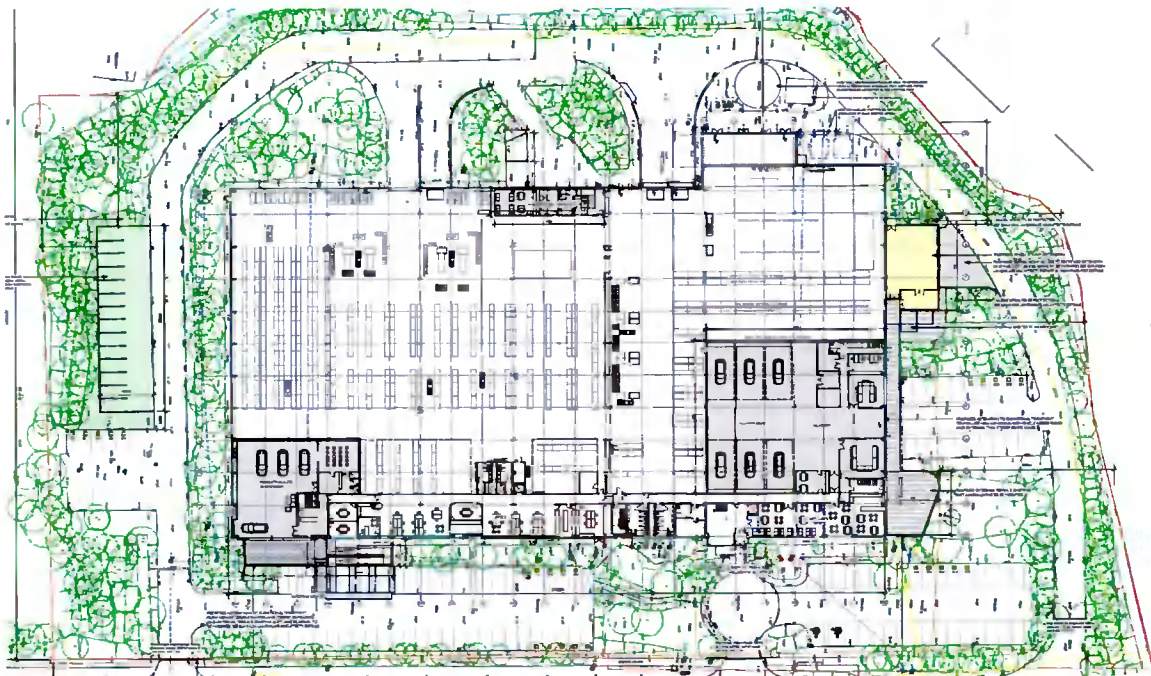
Proposed Site Plan showing internal uses and layout. (Extracted from dwg. no. P-01 EMD Architects)
